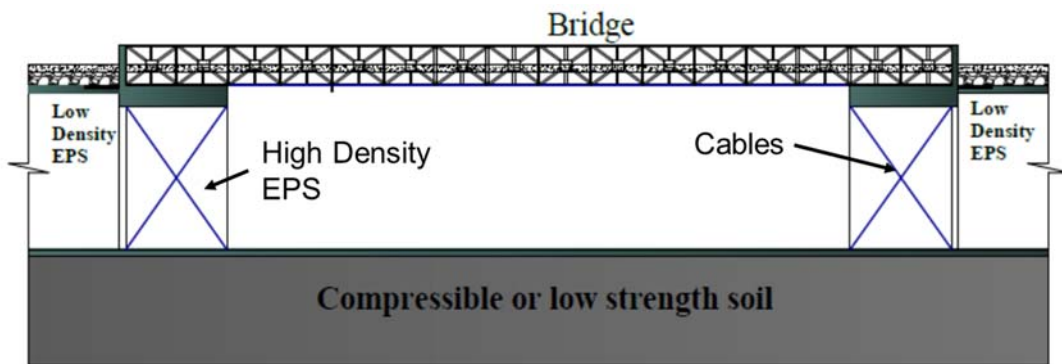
Conceptual bridge support with a rectangular prismatic shaped EPS embankment
